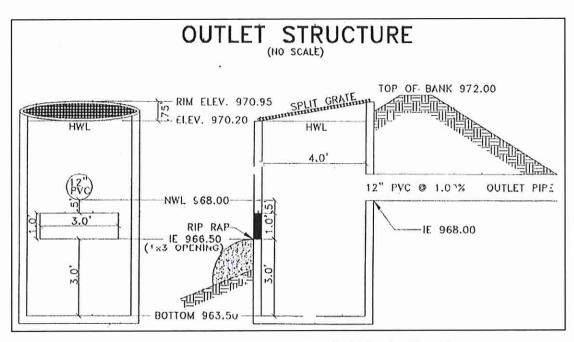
Pond 15 Outlet Structure Detail with Design Elevations
